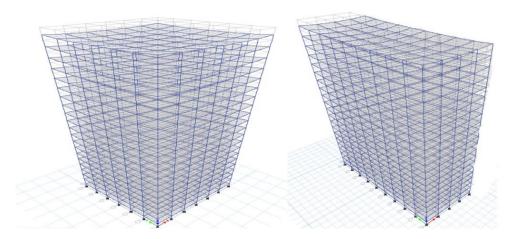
Structural deformation of Square and Rectangular for G+20 Story building
